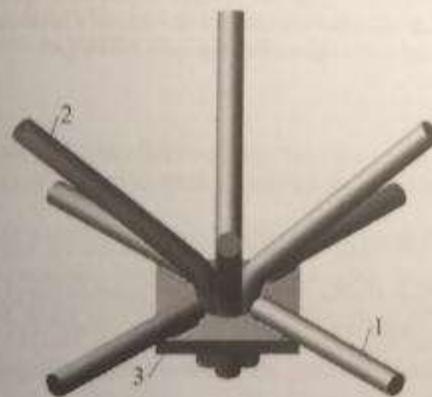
Welded node of space grid structure: 1 – bottom chord; 2 – slanted rods; 3 – steel plate (by G. M. Gasii)
